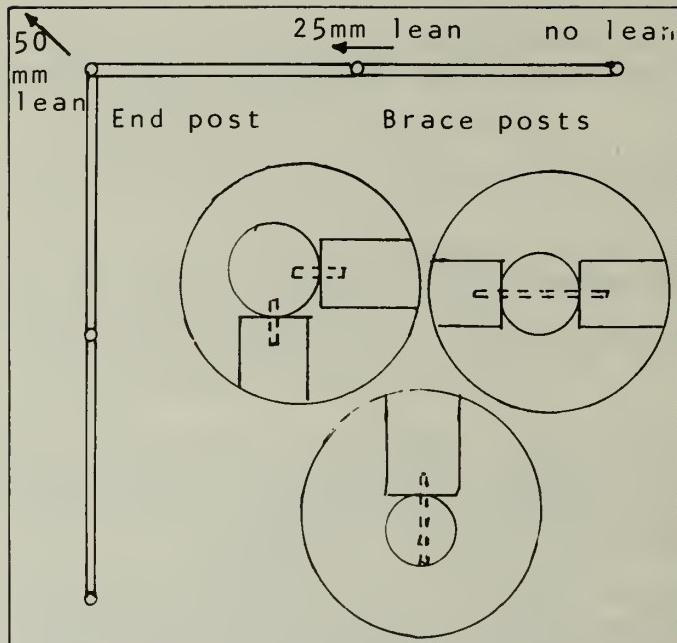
Corner Brace Assembly Showing Joint Detail using Pins
